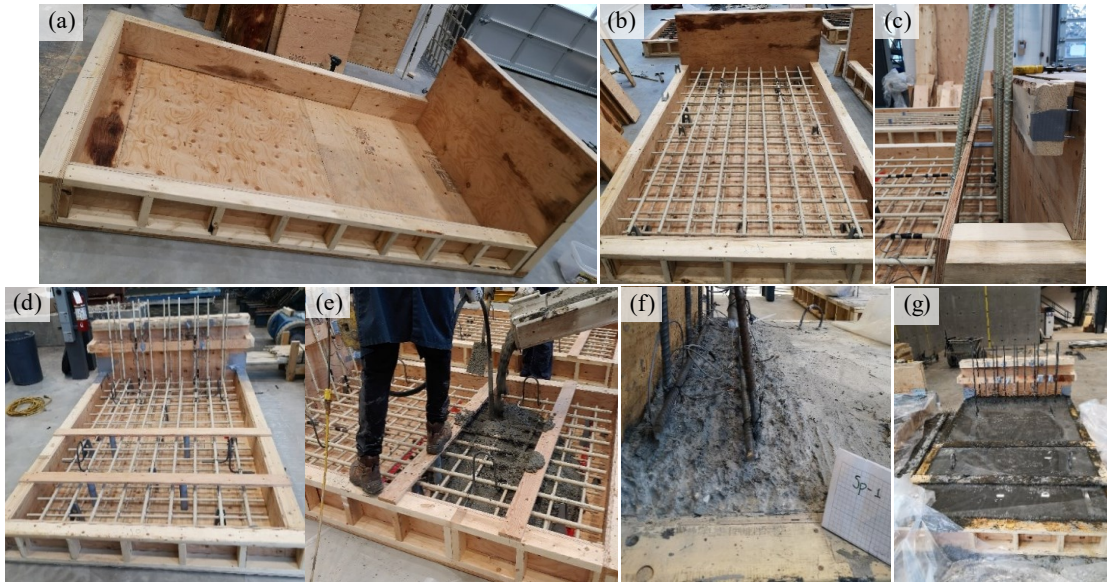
Deck fabrication. (a) deck formwork, (b) SP-02 bar assemblies in form, (c) vertical bars for barrier SP-02, (d) lateral bracing for PVC tubes in deck, (e) deck pouring, (f) SP-01's surface roughened where barrier will be fabricated, and (g) SP-01 deck after 7 days curing.
